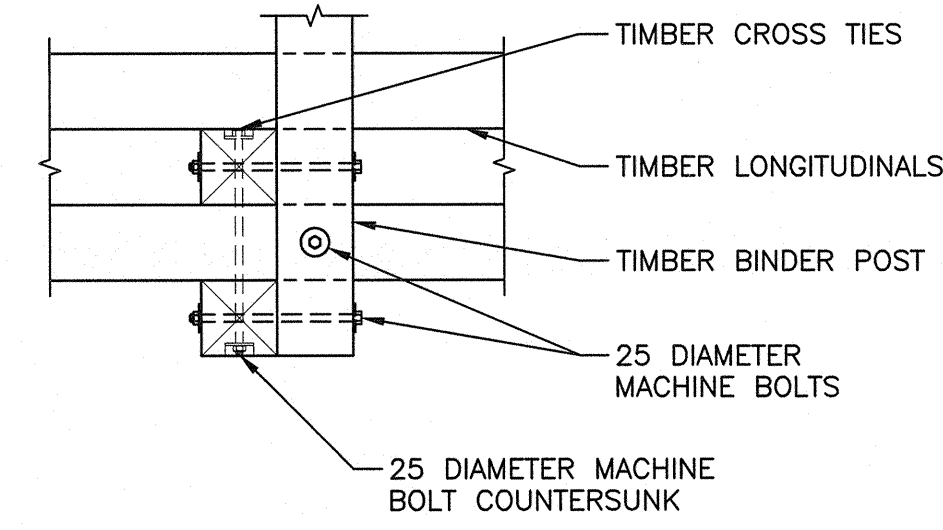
DETAIL - TYPICAL LONGITUDINAL SPLICE 1
